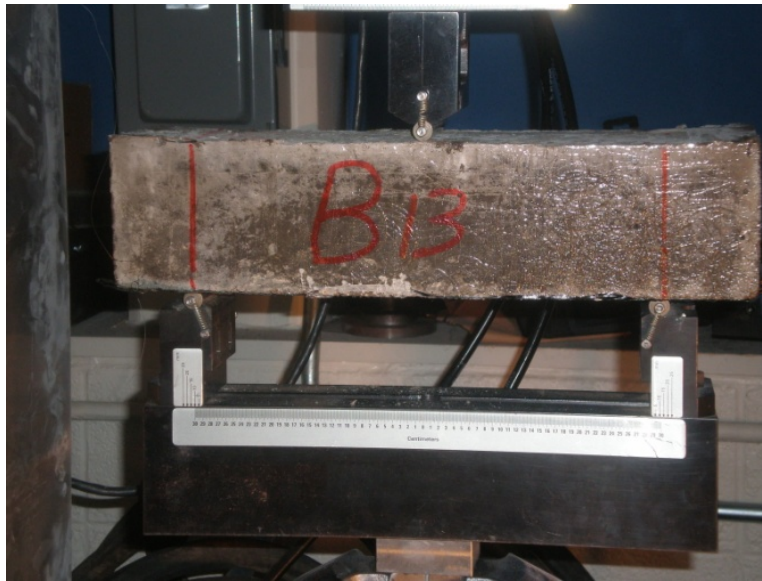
Beam specimens B13 strengthened by SIKA CFRP and FYFE epoxy
